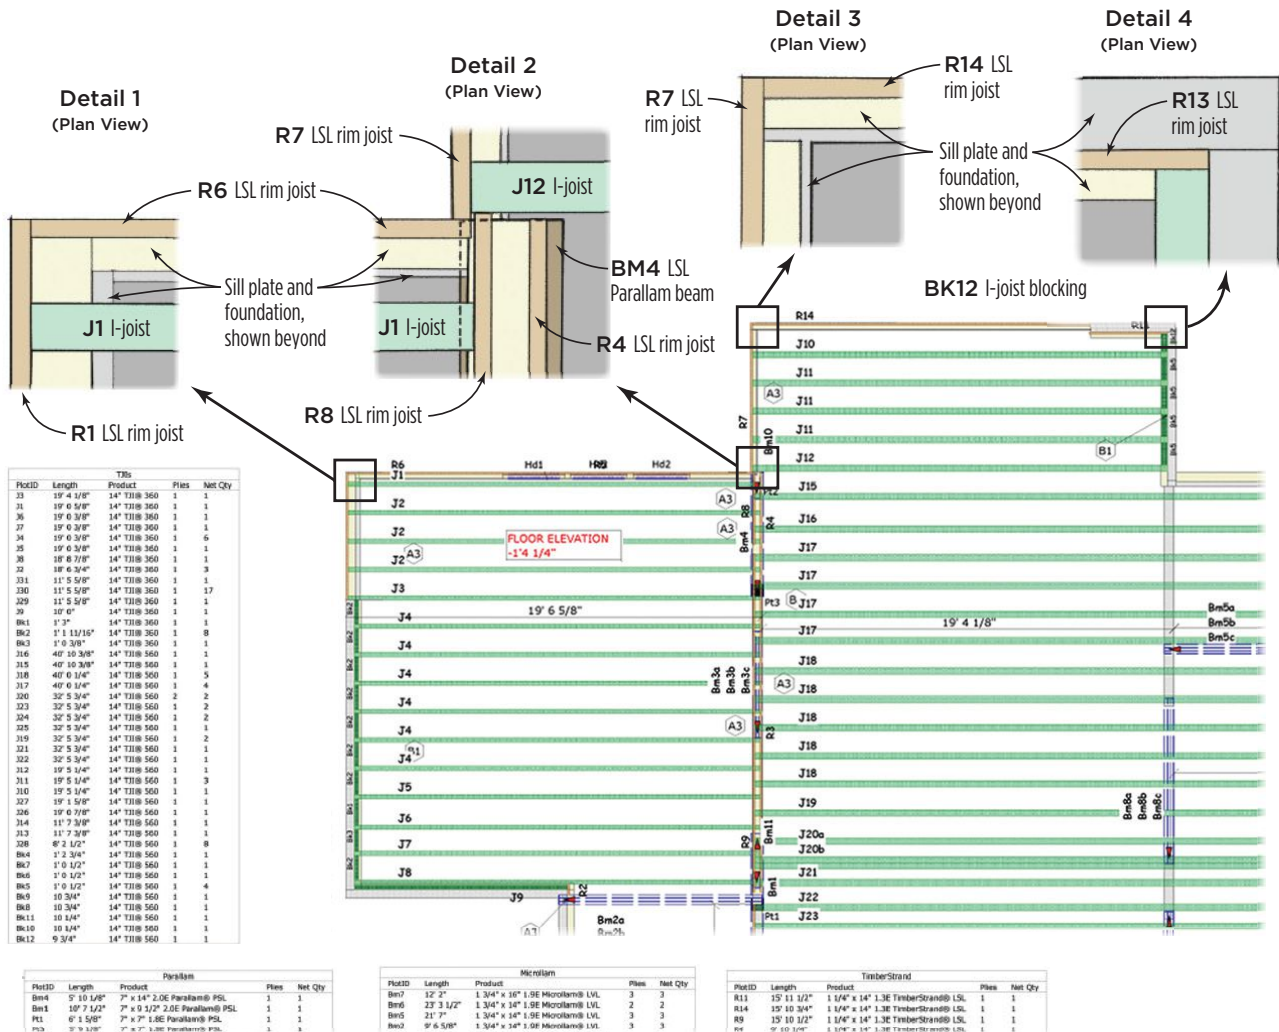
Included with each JobPack framing package is a coded list of materials and placement plans that show the location of each component. To illustrate rim-joist orientation and other tricky connections, the placement plan also provides specific details — shown as enhanced Detail 1, Detail 2, Detail 3, and Detail 4 above.
